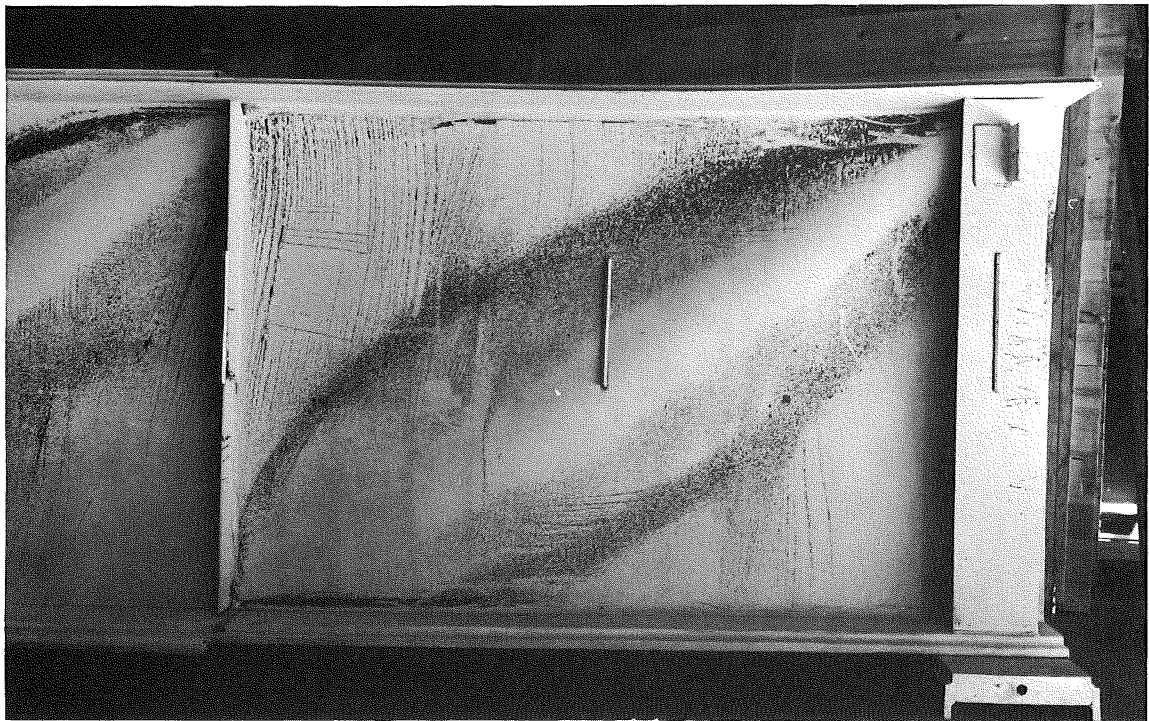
Typical End Panel Failure of Plate Girder (EI)
